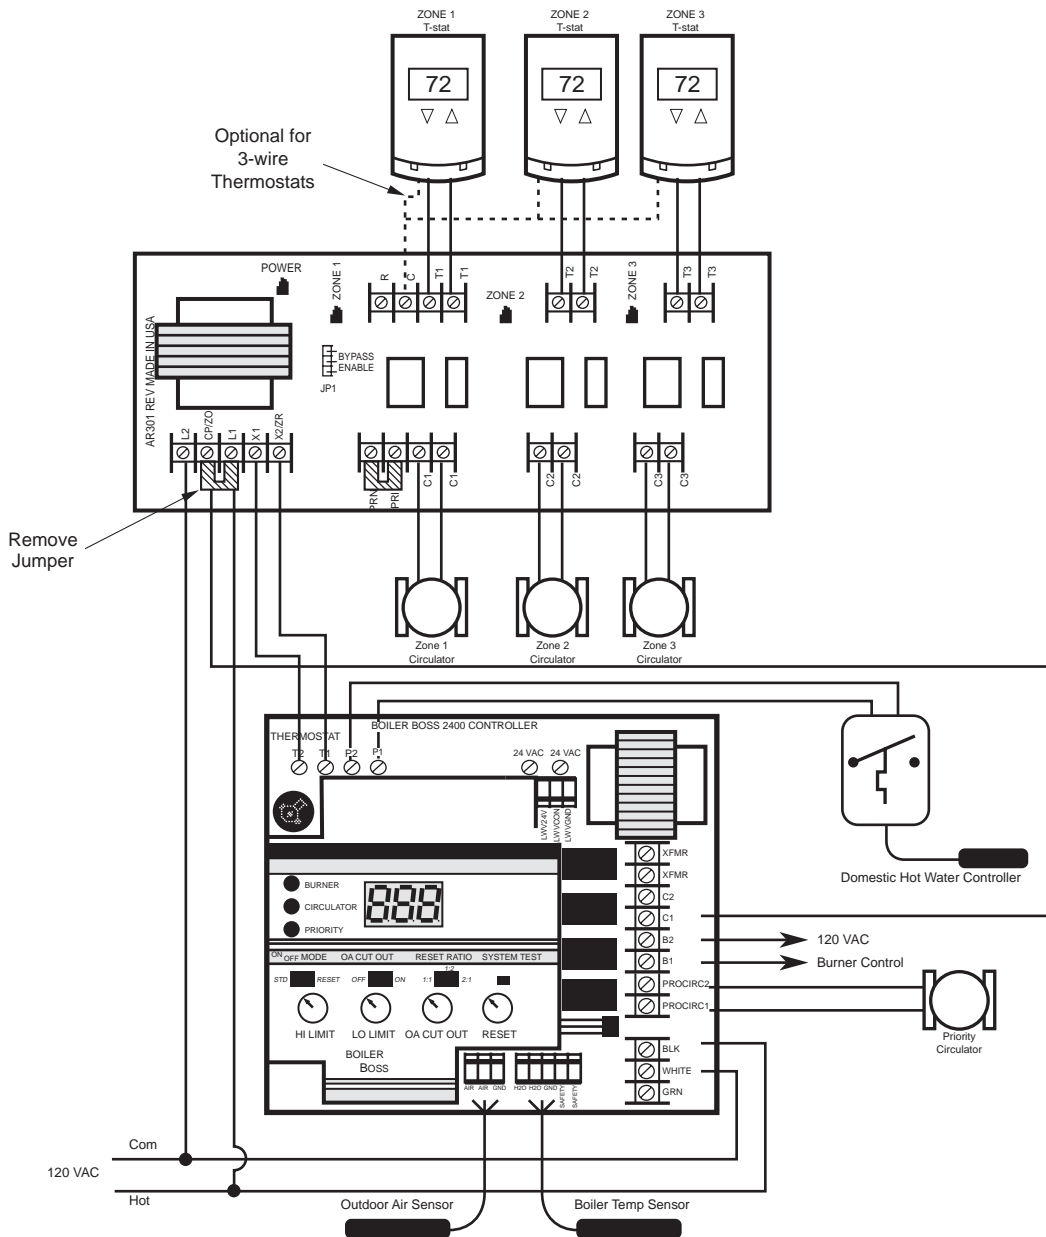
Typical Wiring for Boiler Boss 2400-2 with an SR301.
